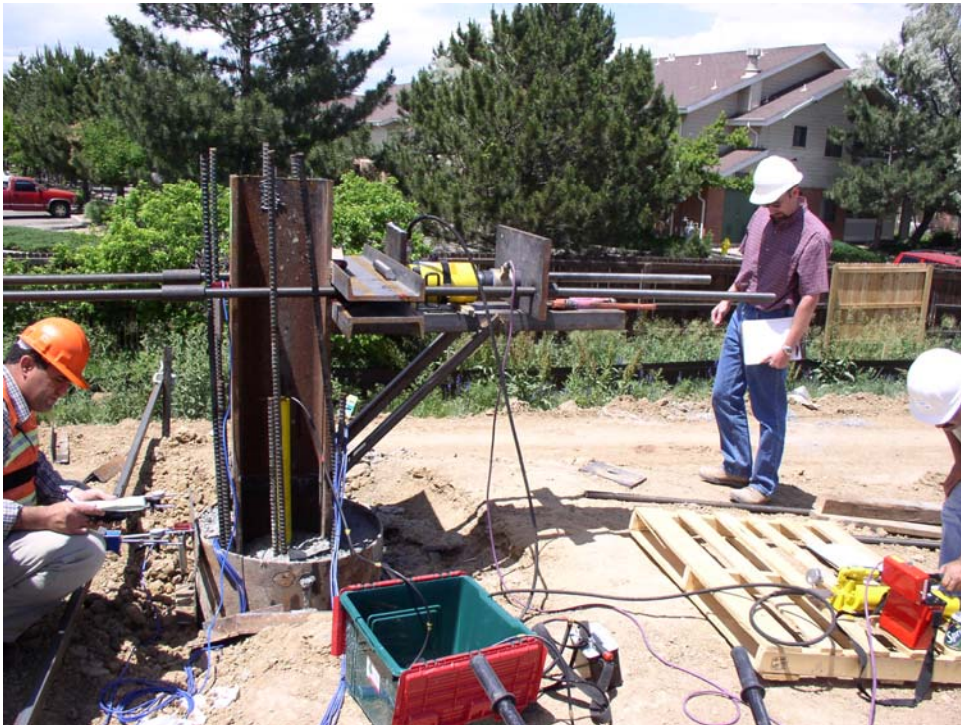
Setup of measuring devices at shaft 2 (South)
